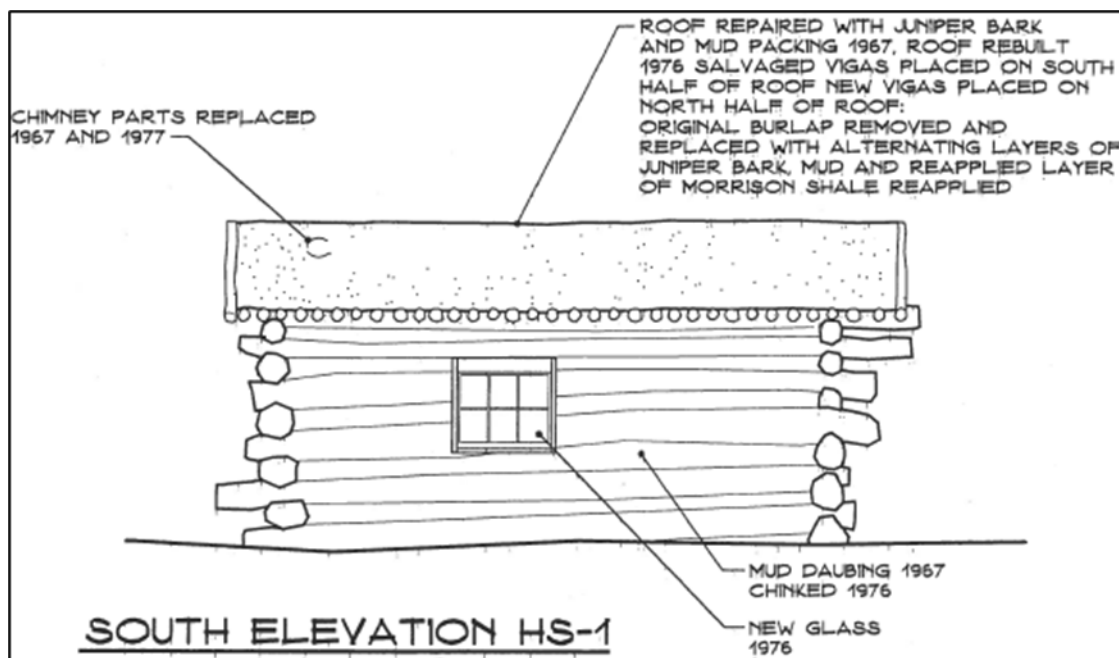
Chronology of South construction elevation from Wolfe Ranch Historic Structures Report Arches National Park (1999)
